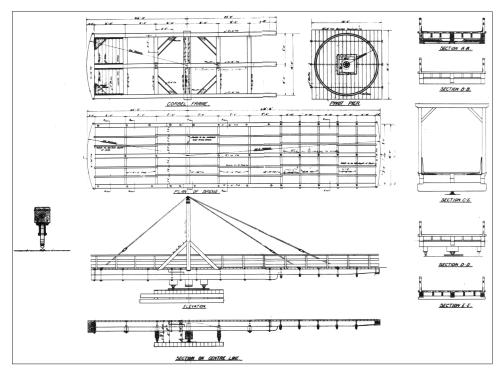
Upgraded and widened version of the Rideau Canal timber swing bridge design prototype, erected at Rideau Ferry in 1947. (PWGSC, Rideau Canal, microfiche drawings, R-2-106, "Rideau Ferry Plan & Sections," n.d.)
